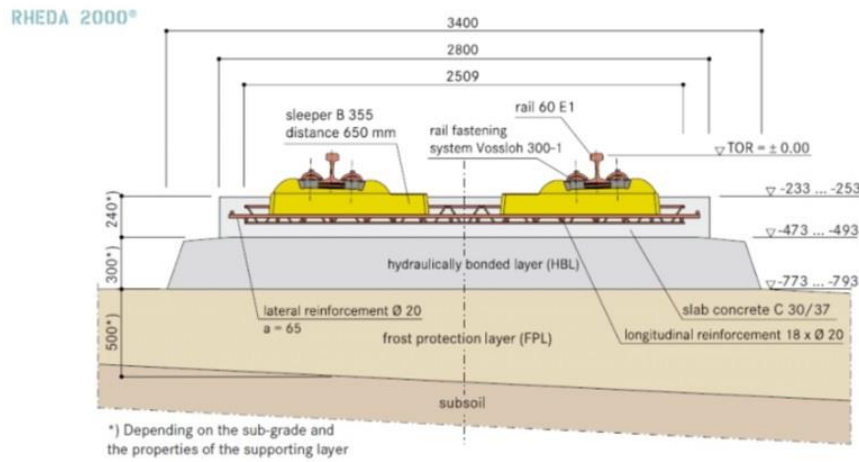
General layout for Rheda 2000 Slab Track system (Rail One, 2020)
